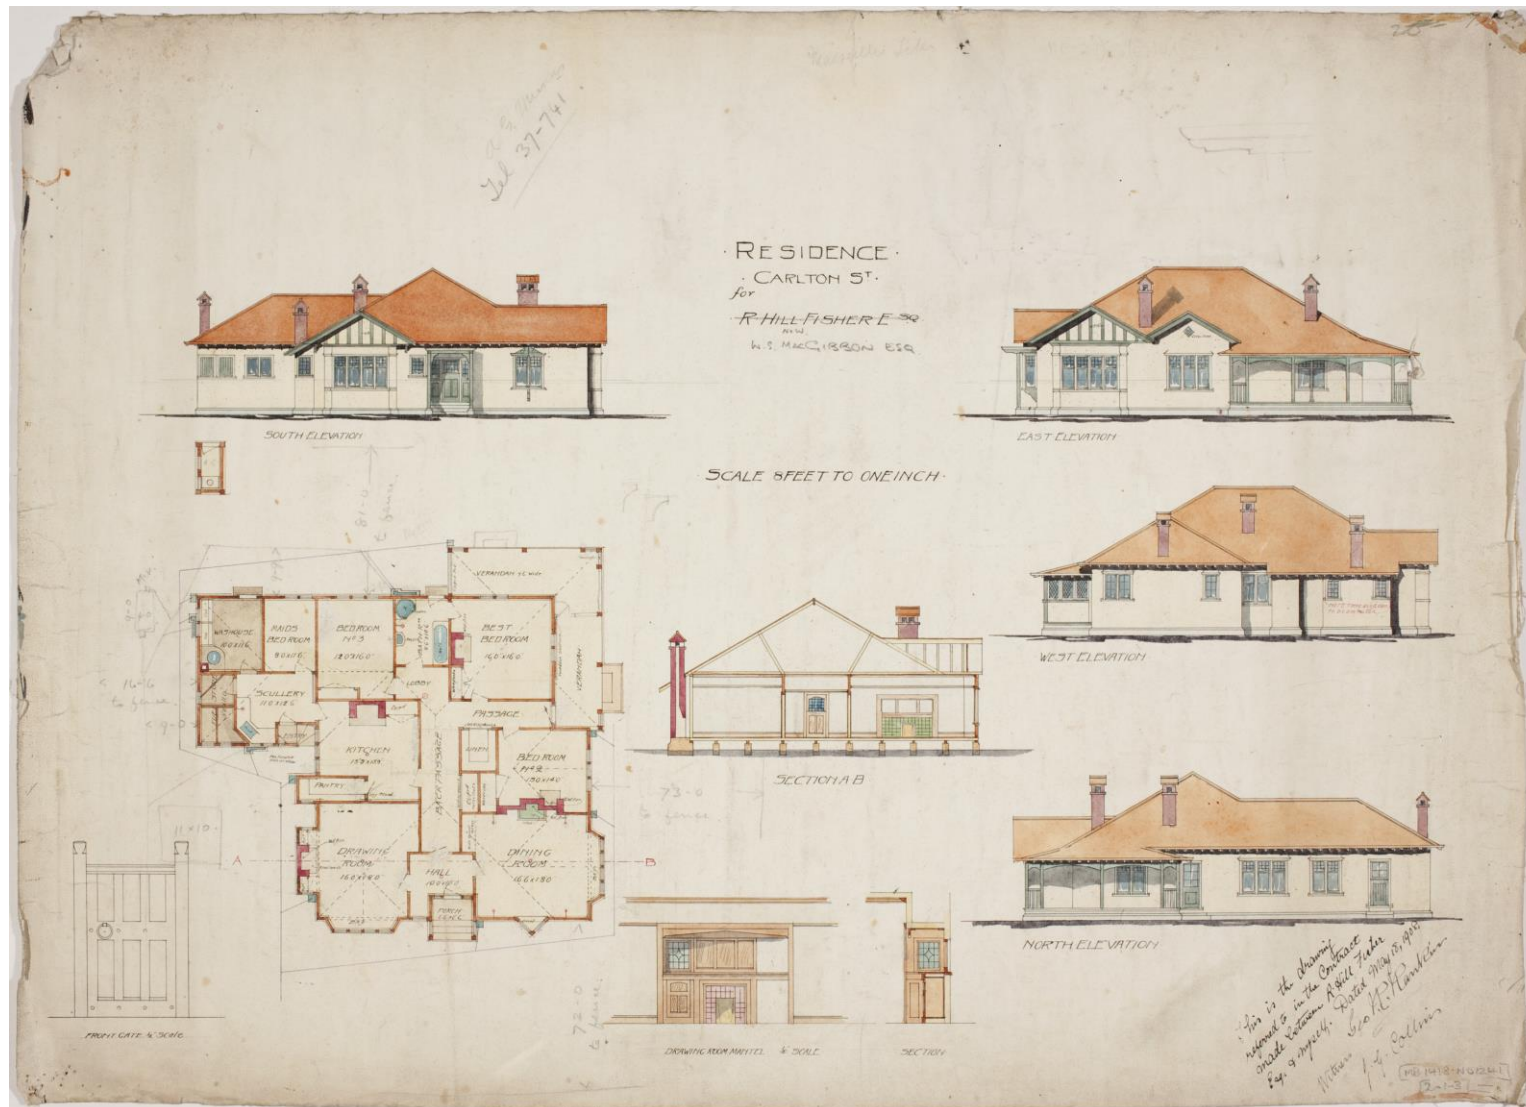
Collins and Harman, Residence, Carlton Street, for R. Hill Fisher, Esq., plans, elevations, section and details (1908).
